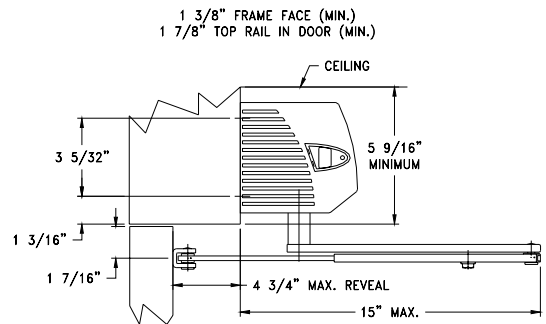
OPERATOR CLEARANCES-PUSH ARM
